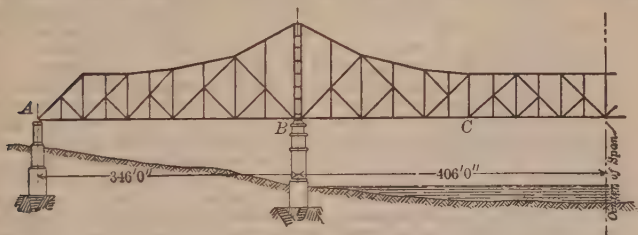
Wabash R.R. Bridge, Pittsburgh, Pa.
